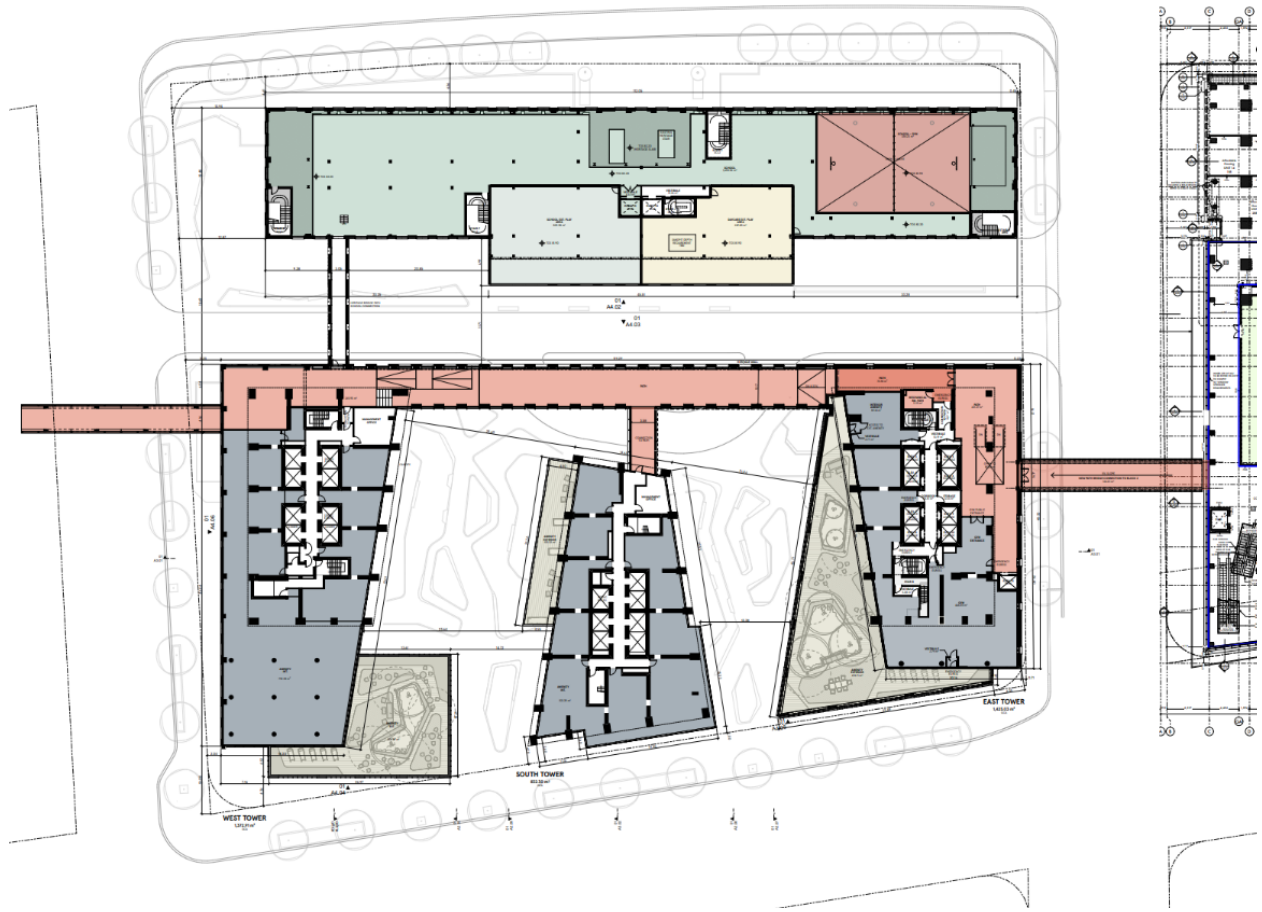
Level 2 floor plan for 55 Lake Shore Boulevard East included for illustration purposes (architectsAlliance, February 14, 2026).
